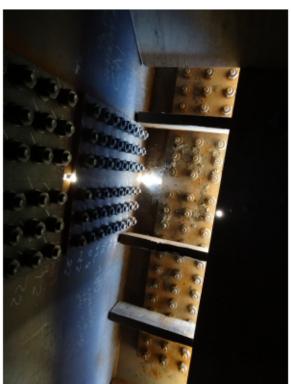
Typical girder splice bottom (NW first splice, west girder)
